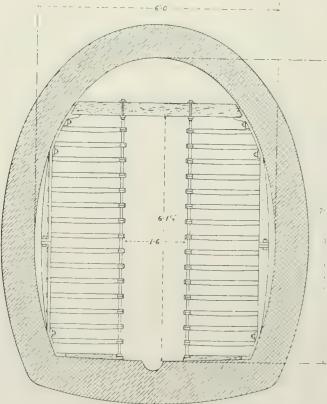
CROSS SECTION OF LATERAL CONDUITS. Showing Racks for the Cables,
